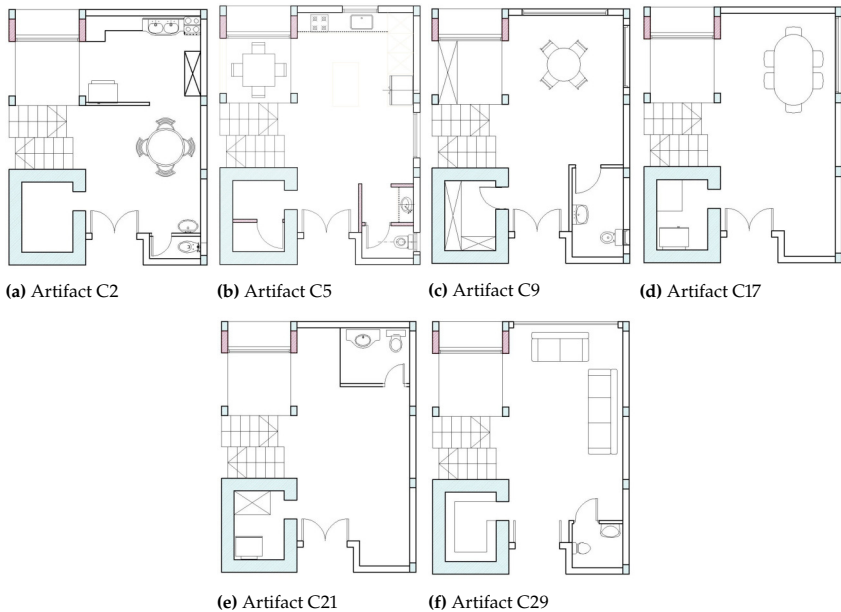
Level 0 plan artifacts (Experiment 14)
